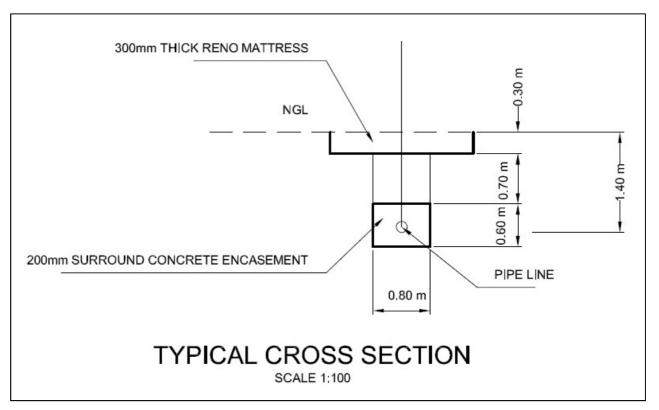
Typical cross section for watercourse crossing No. 4 (Drainage line: 29°03'16.05"S; 29°47'38.98"E)
